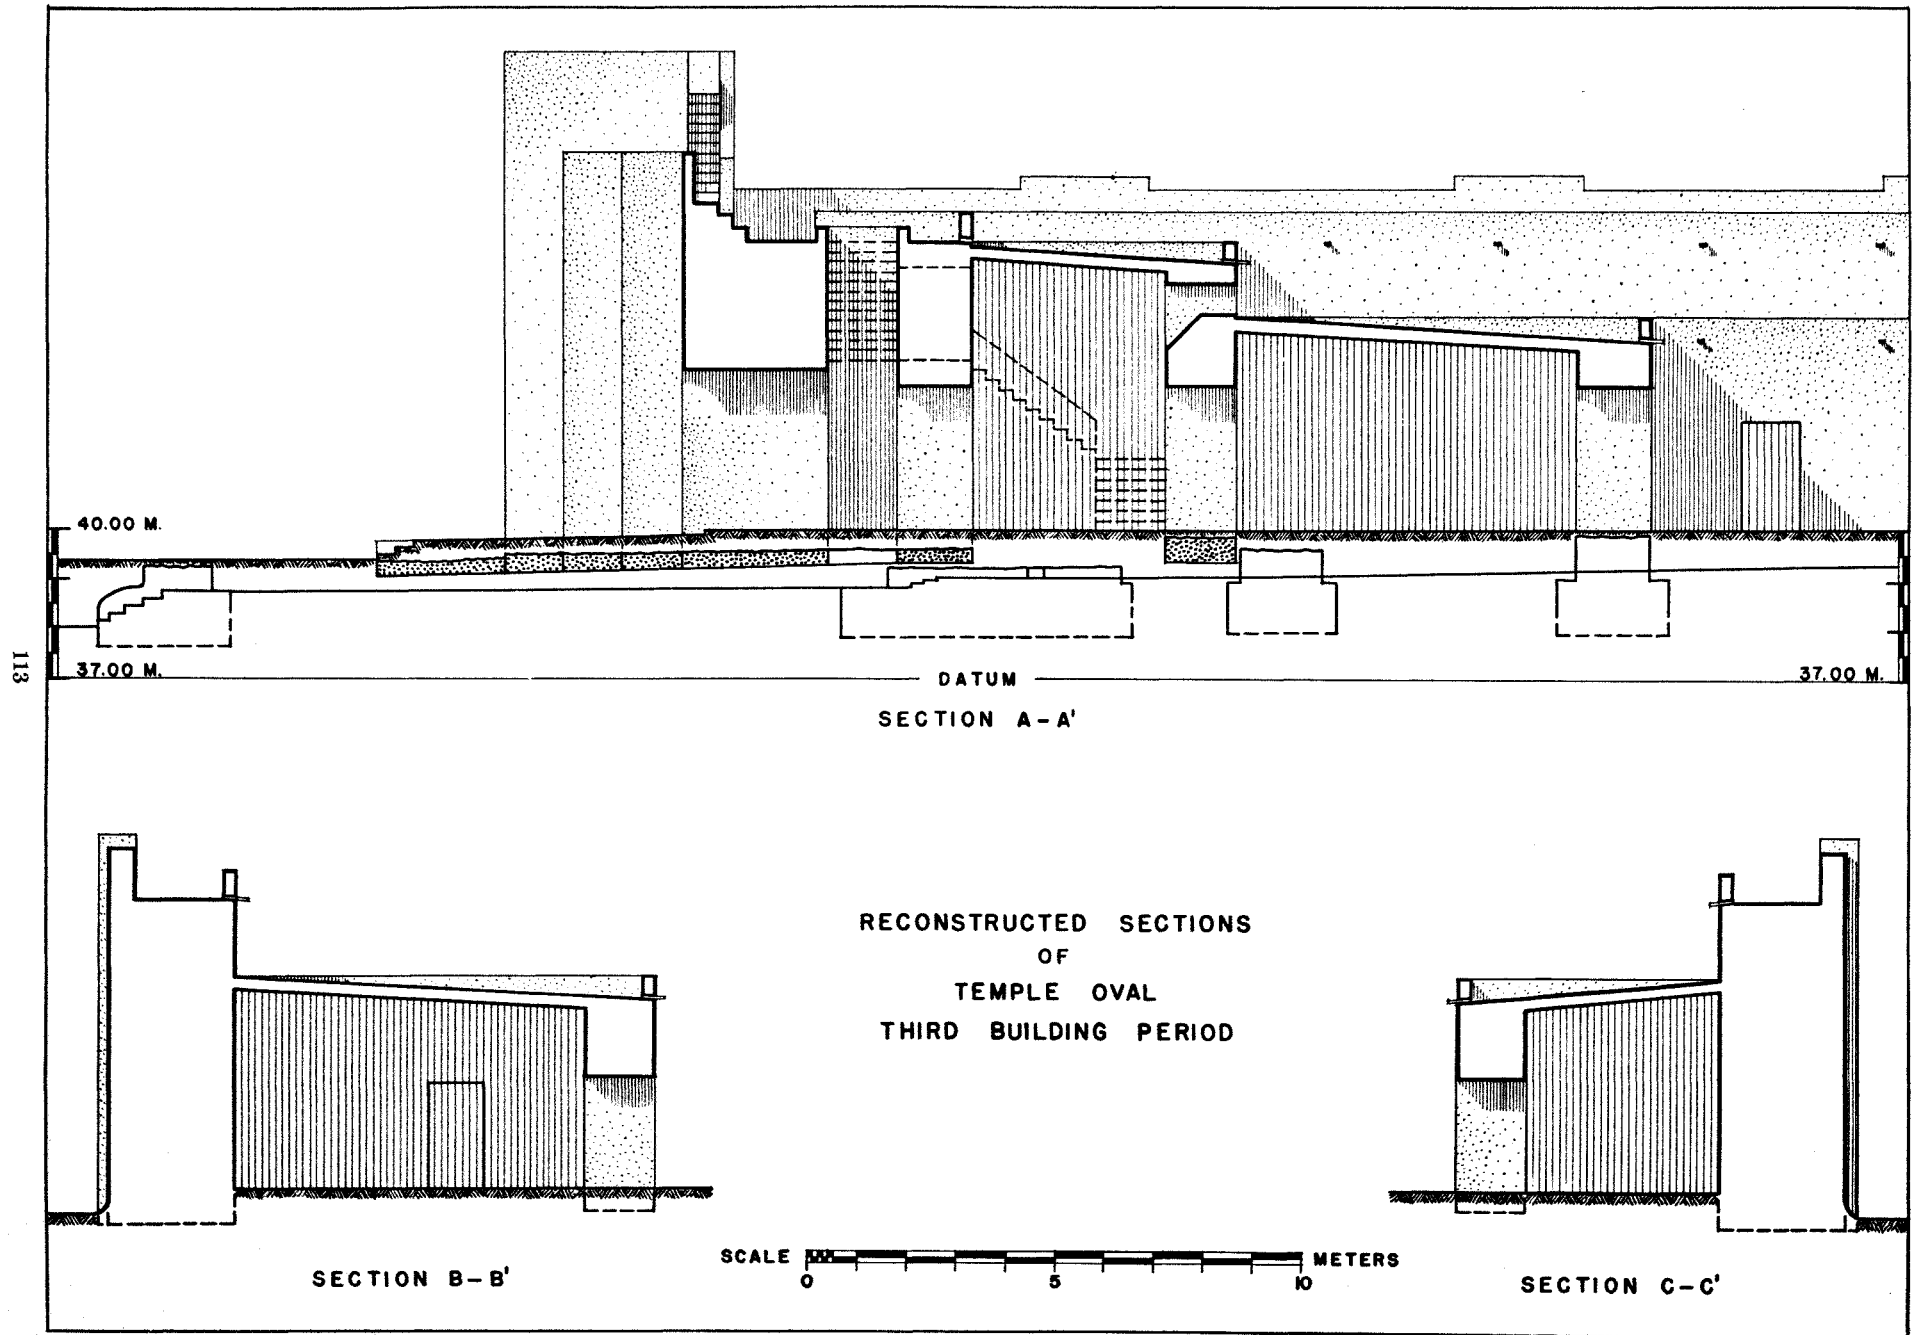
RECONSTRUCTED SECTIONS OF THE TEMPLE OVAL OF THE THIRD BUILDING PERIOD, BASED ON THE PLAN IN FIGURE 103. SCALE, 1:150
